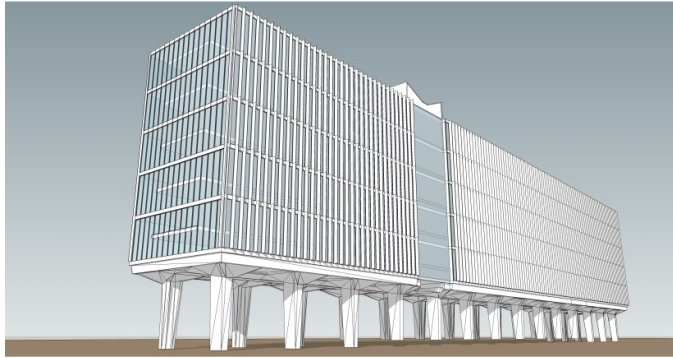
Impression Main Building with fin façade (620 mm.)
